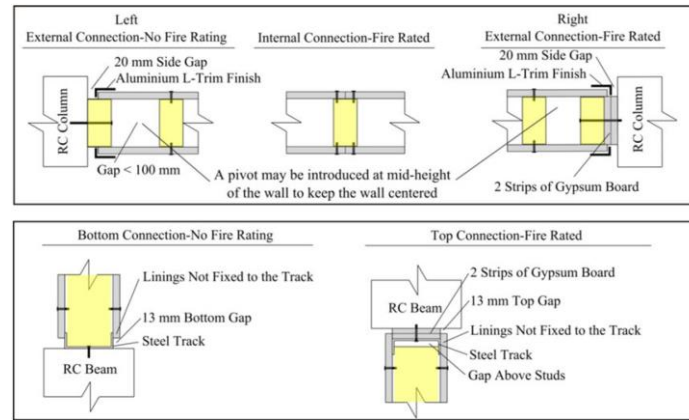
Details of low damage timber or steel framed specimens from Tasligedik *et al.* (2015)
